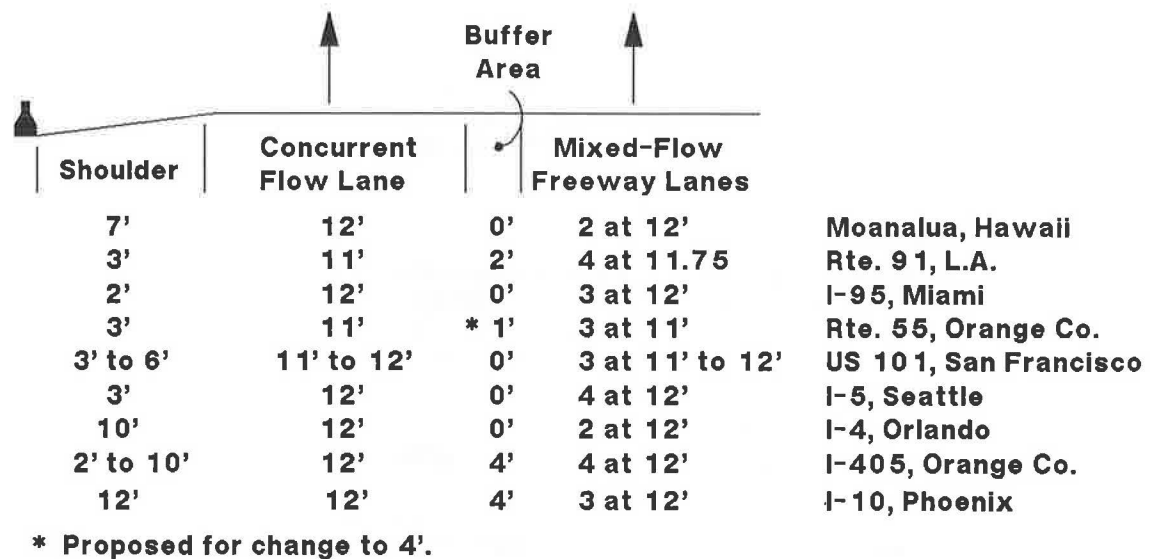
Typical cross sections of concurrent-flow lane projects.
